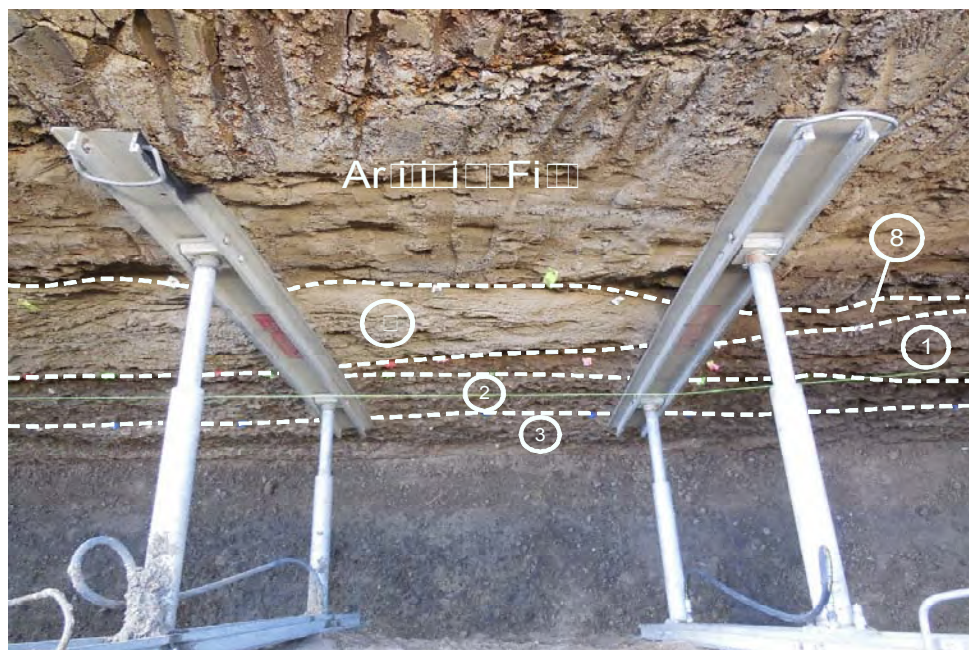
Trench 1 – Young alluvial deposits, channel deposits, and underlying older fan deposits (Station 2+75)
